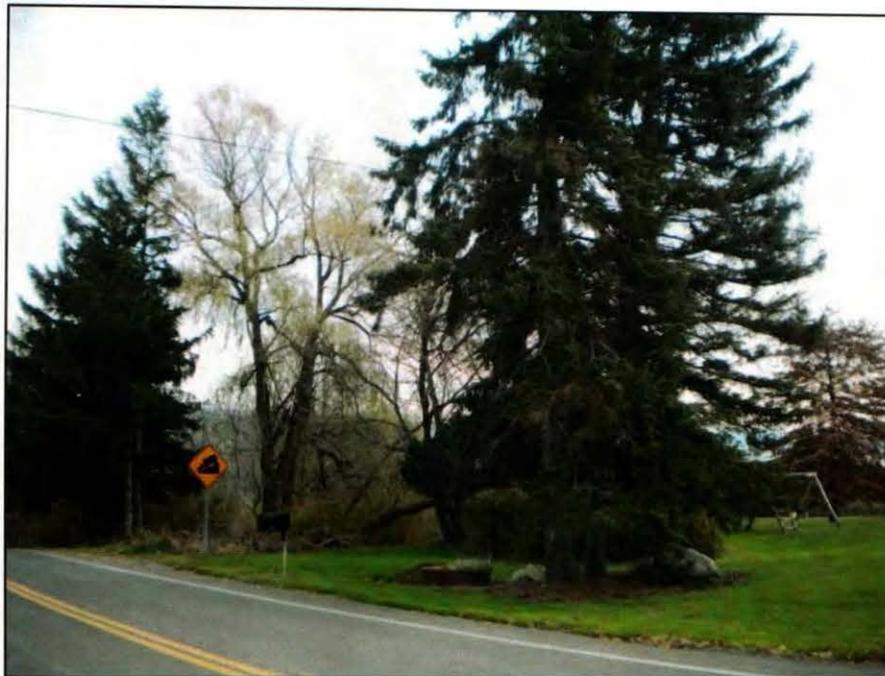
244 Ludlowville Road Rear Yard - Site of proposed staging area; construction footprint in the wooded area beyond yard
